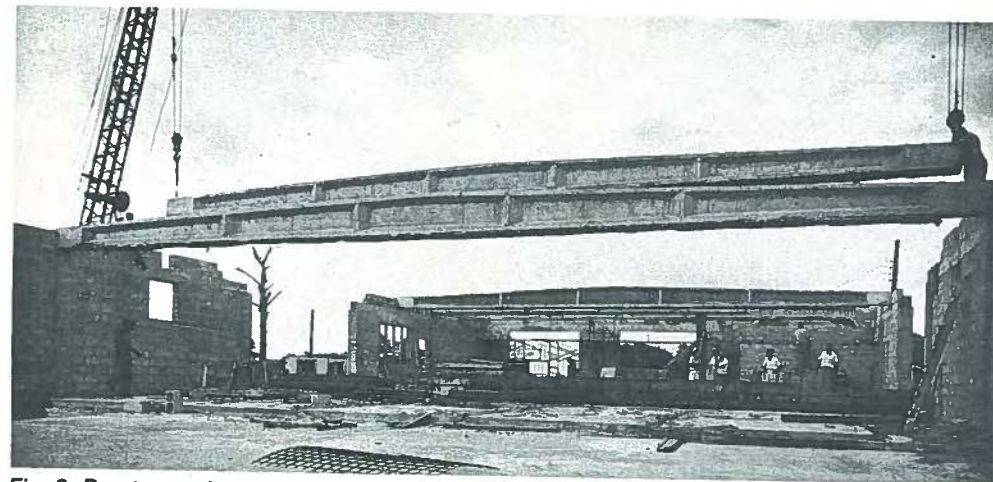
Prestressed tapered I-beams being erected in 1953 for warehouse roof in Sarasota. The 60-ft (18.8 m) beams were pretensioned on the warehouse floor. Courtesy: Paul Zia.
